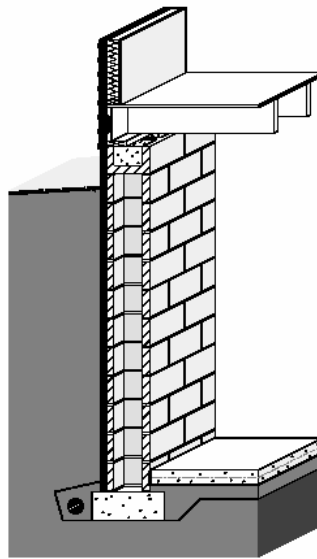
Concrete Masonry Basement Wall with Exterior Insulation
